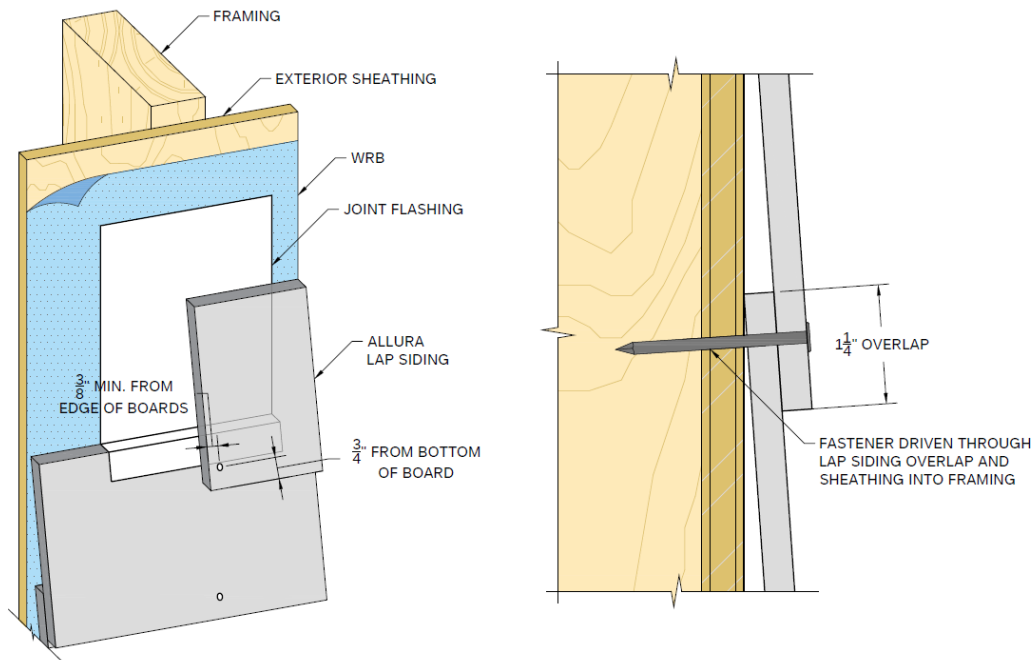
Allura® and TerraPlank™ Lap Siding Face Nail Fastening Details
